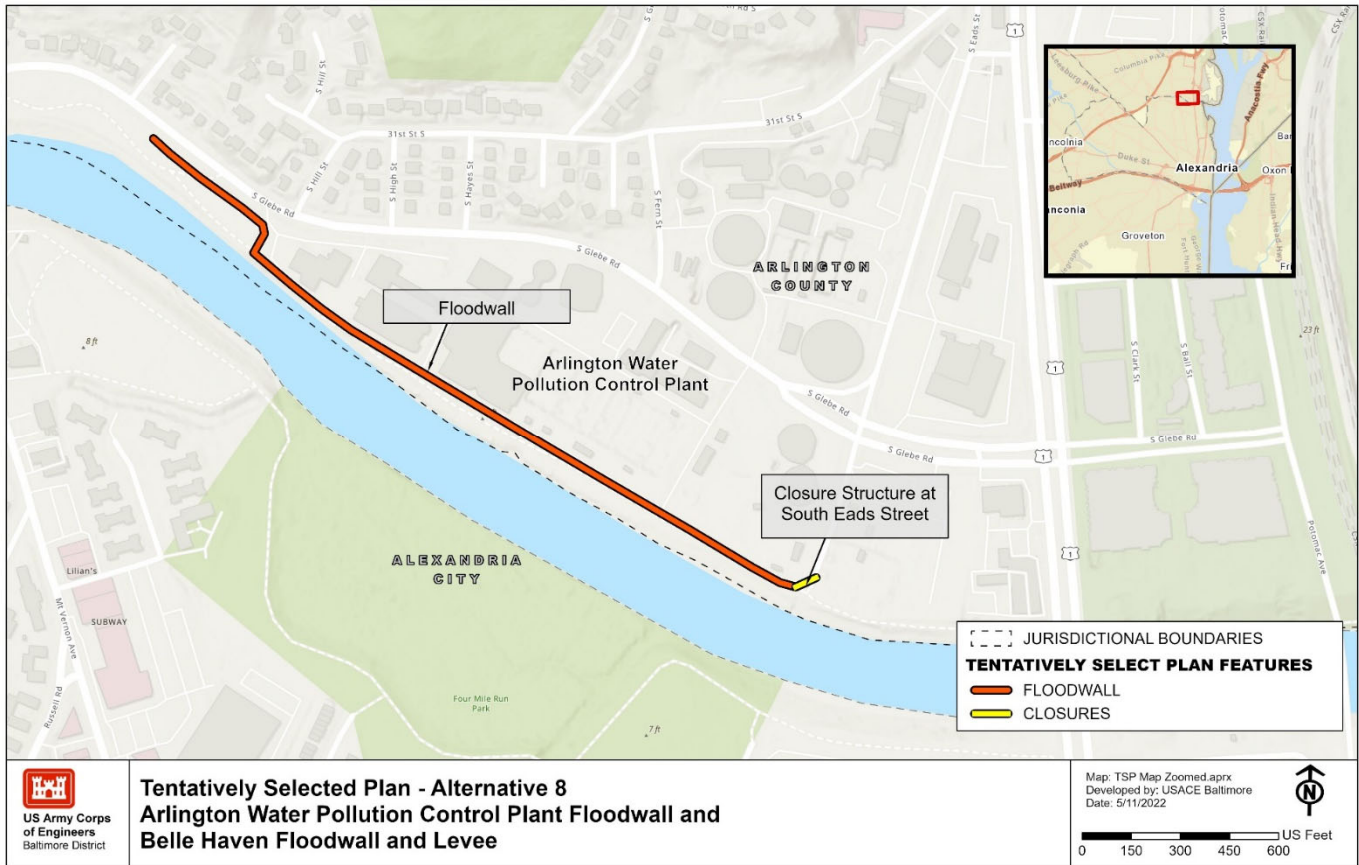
TENTATIVELY SELECTED PLAN – ARLINGTON WATER POLLUTION CONTROL PLANT FLOODWALL
